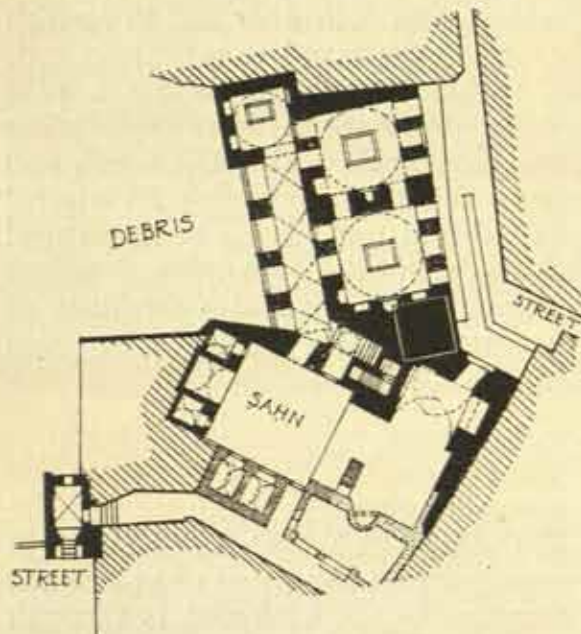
CAIRO: MADRASAH OF THE AMĪRS SALĀR AND SANJAR AL-JĀWLĪ. PLAN
